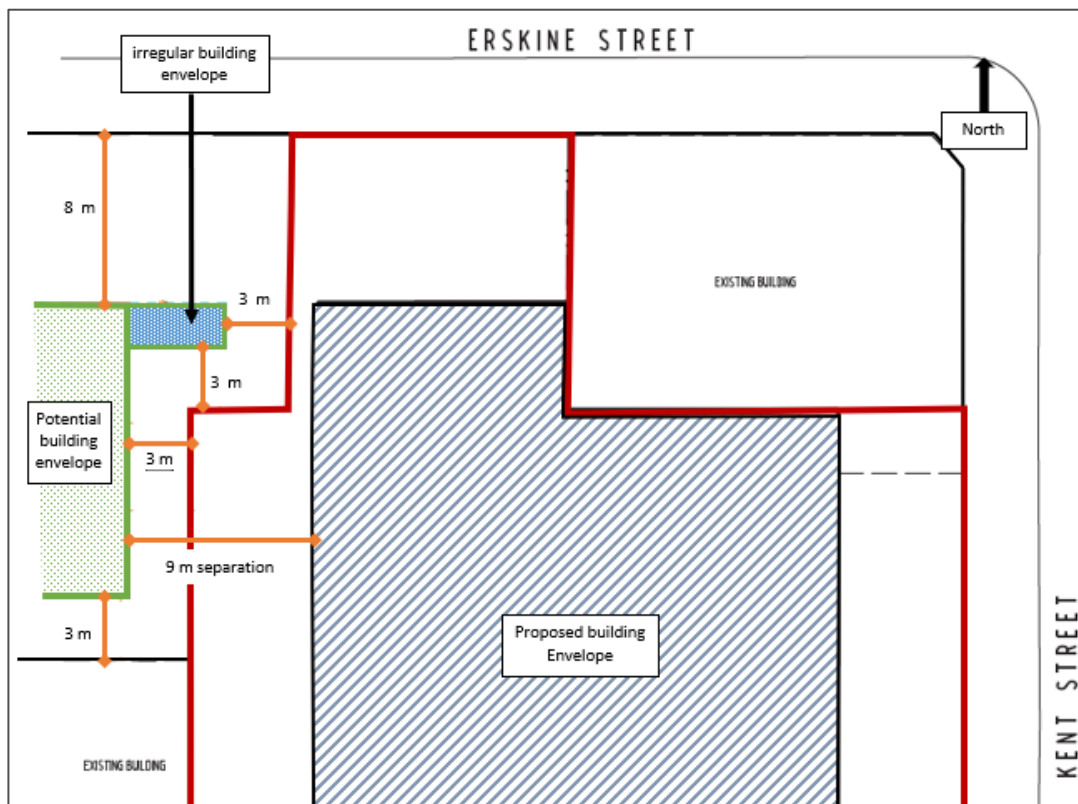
| Development potential of adjoining site (source: ARRTS Architectural drawings)
